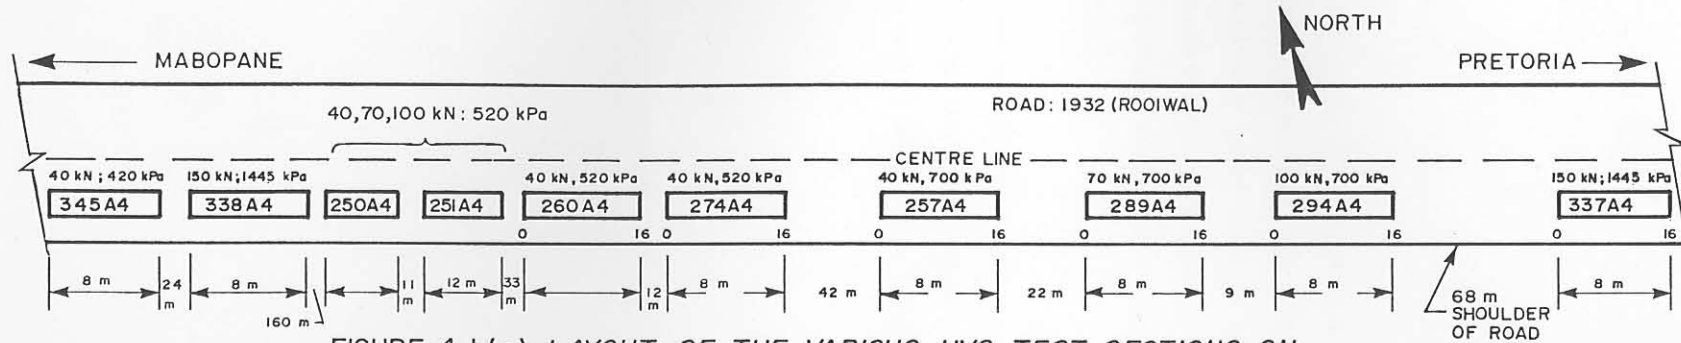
(a) LAYOUT OF THE VARIOUS HVS TEST SECTIONS ON ROAD 1932 (ROOIWAL)
